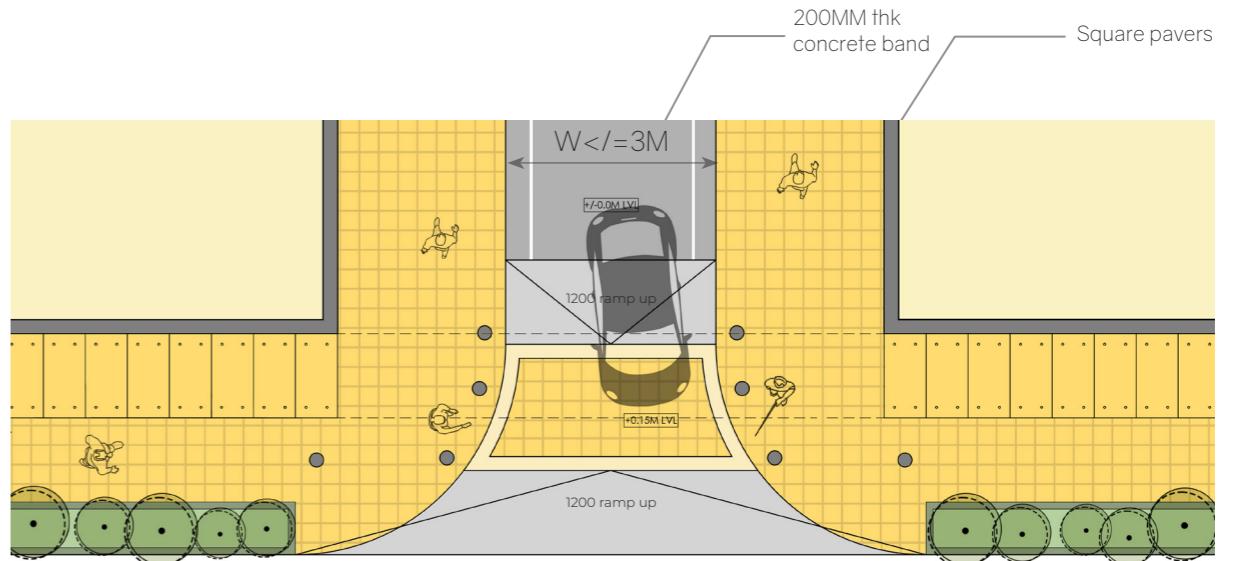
Diagram indicating minimum 1.8M wide HRPC at cross road junction of road width < 3M
